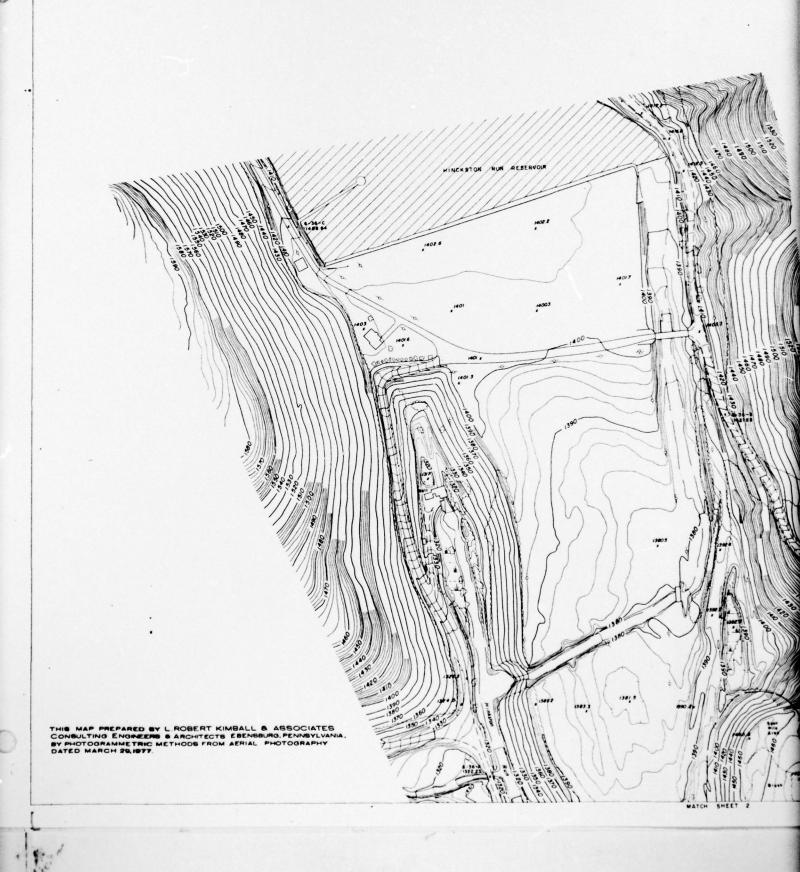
HINCKSTON RUN DAM GENERAL PLAN FIELD INSPECTION NOTES
